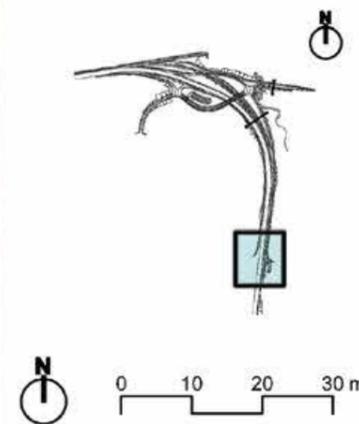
Plan of the proposed shared path connections to the Northfields pedestrian overpass extension - BR04 (Scale 1:1000)
